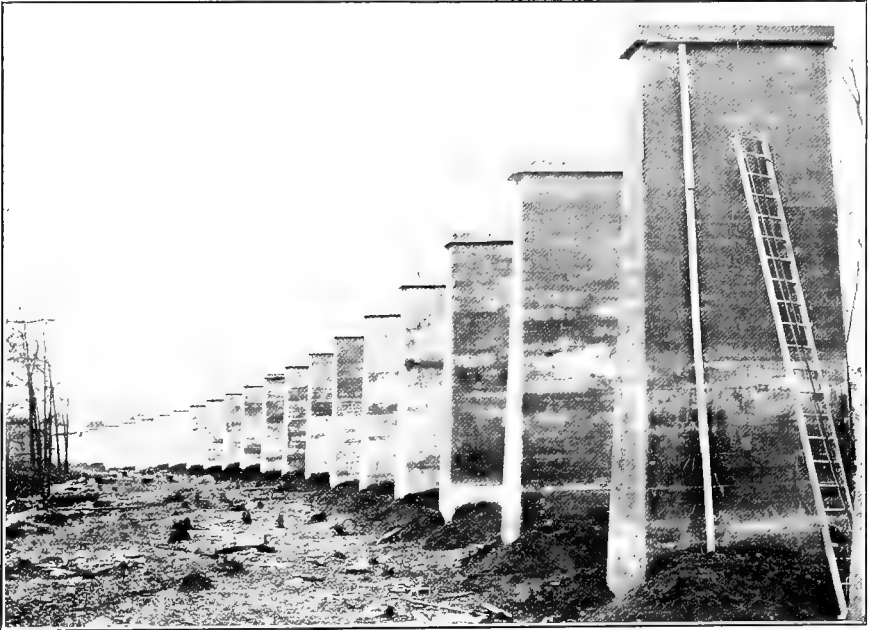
CONCRETE PIERS, PATERSON AND SUFFERN RY.
